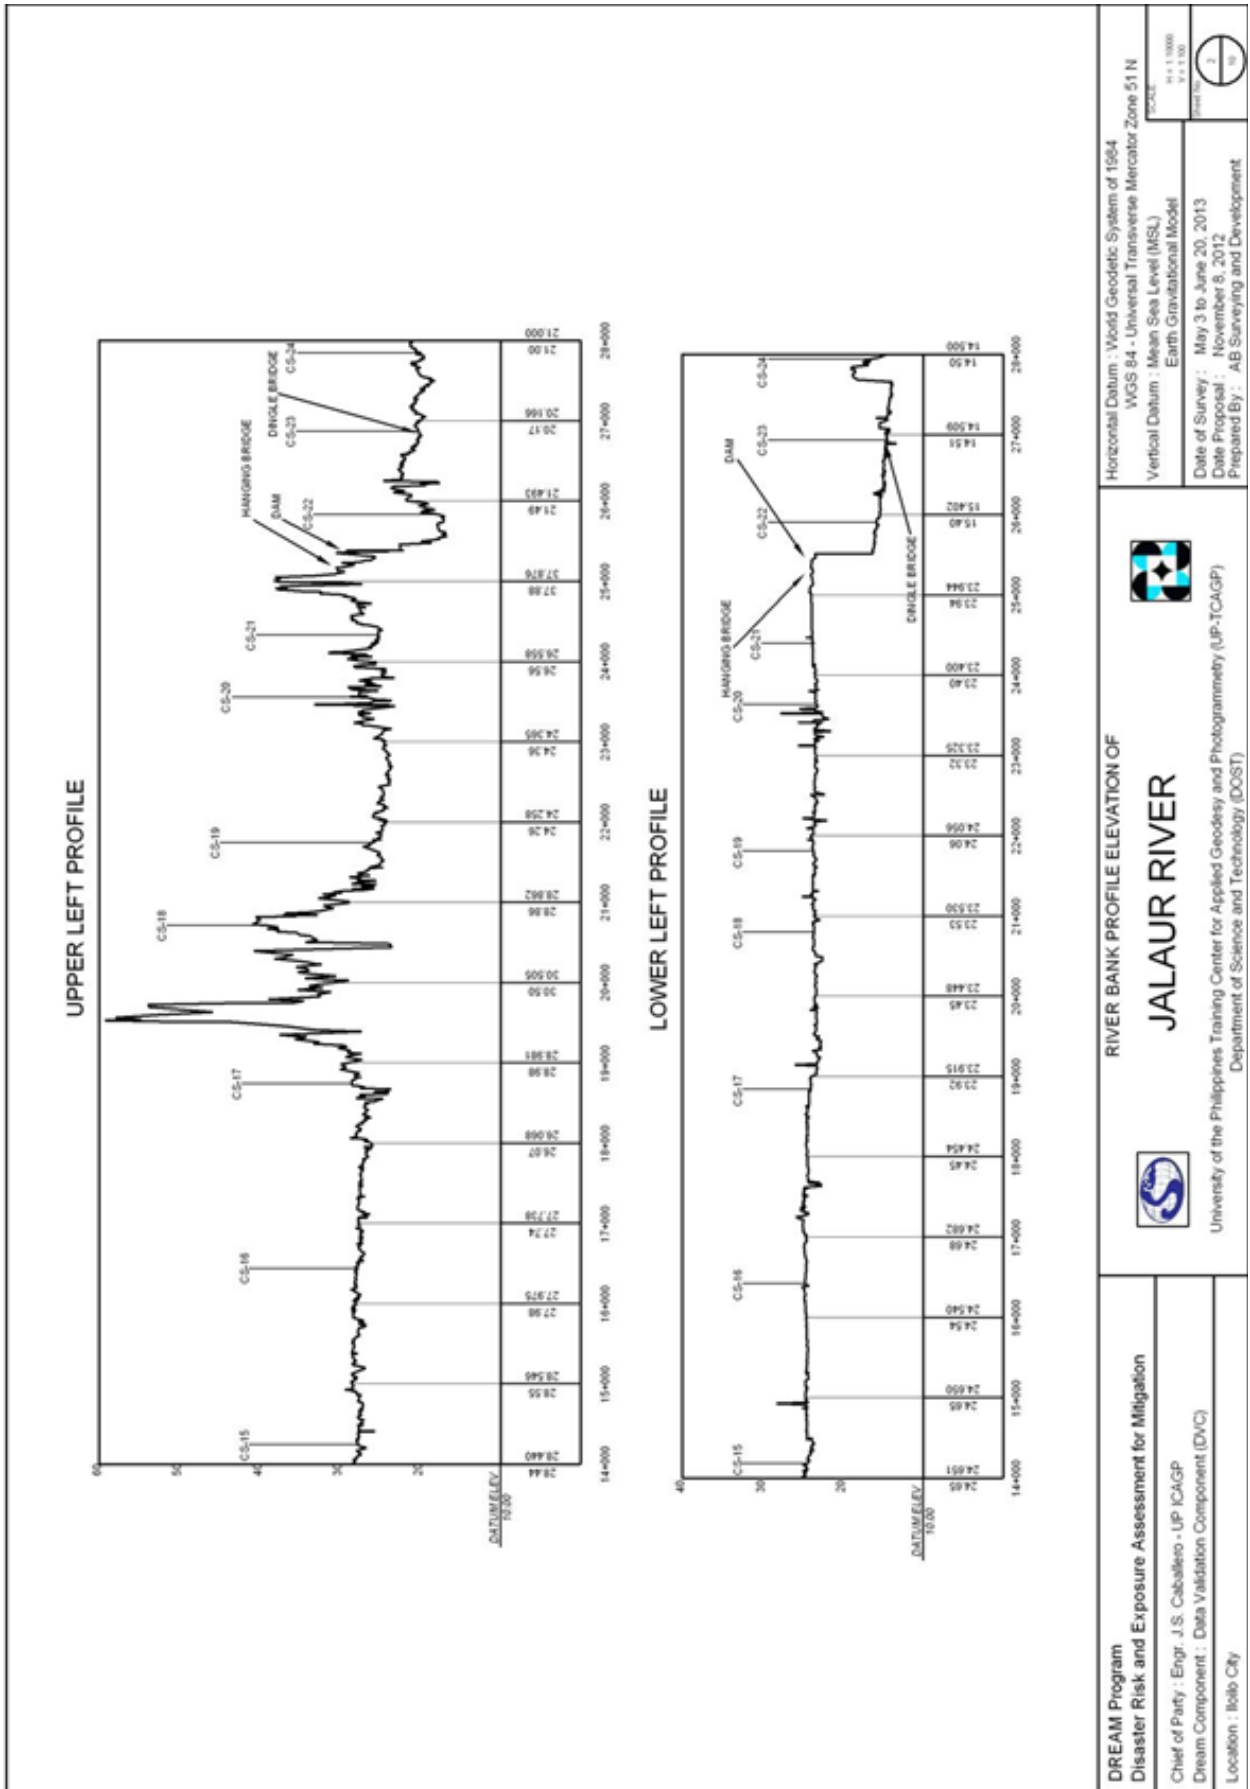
Sheet No. 2 Left River bank profile with relative location of bridge and cross-section
